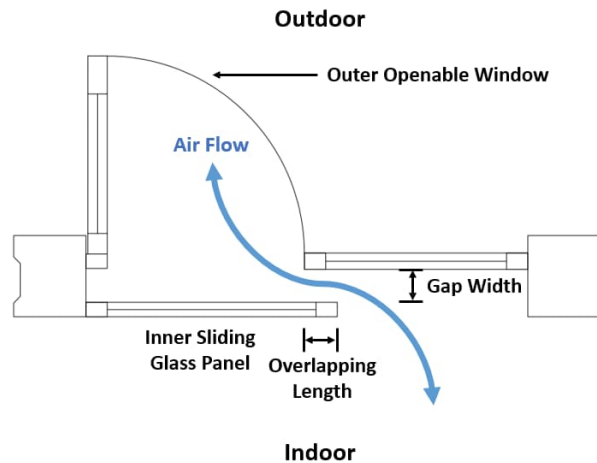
A Plan on Acoustic Window (Baffle Type)
